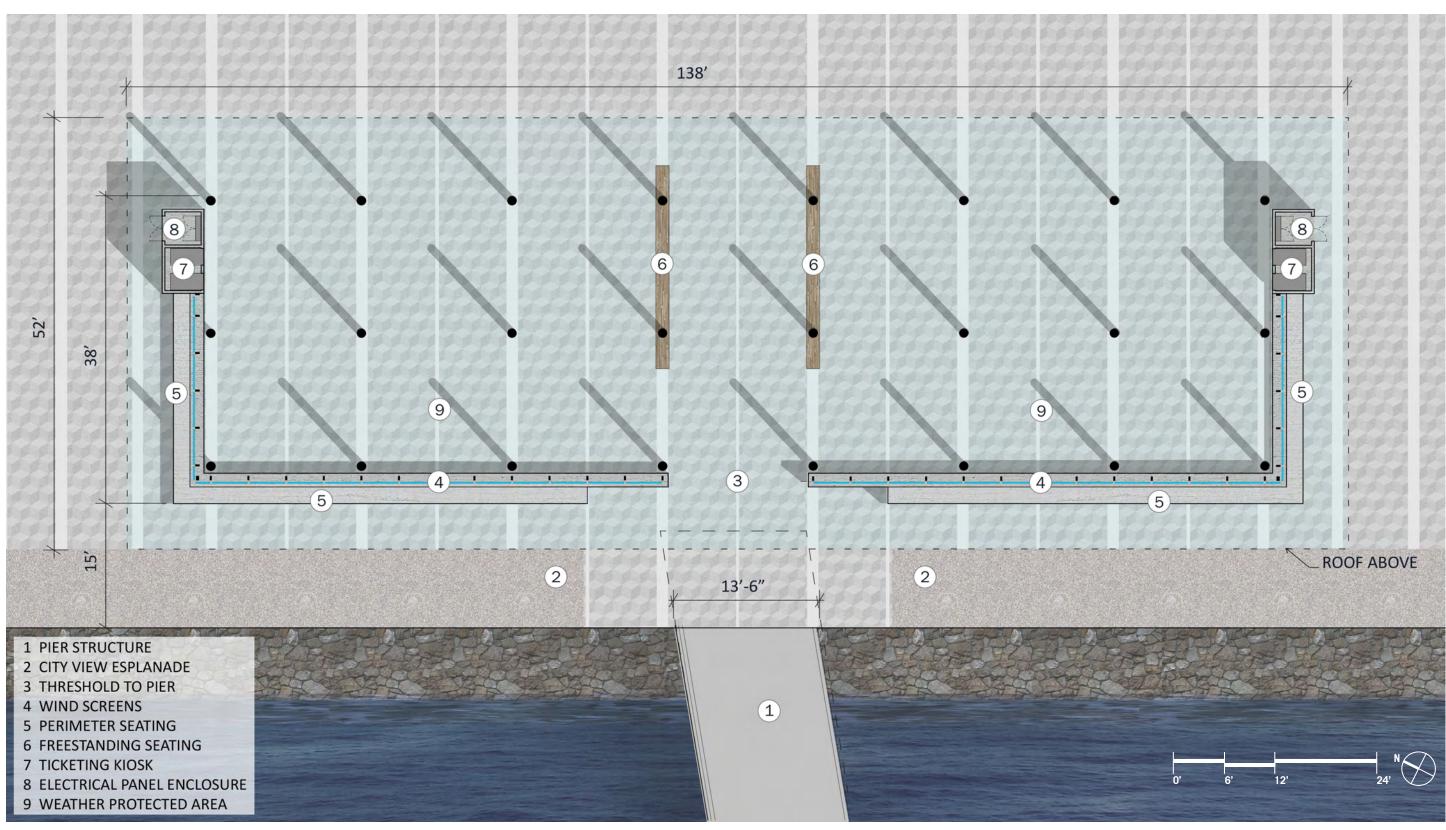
FERRY SHELTER ILLUSTRATIVE FLOOR PLAN
